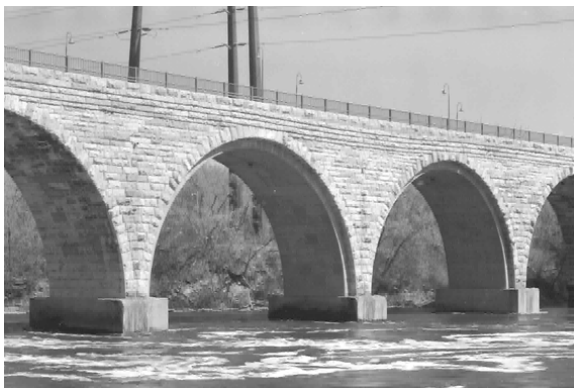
View showing the concrete liners of arch spans 6 and 7 and the concrete encasement of footings for piers 5, 6, and 7. Visible in the stone corbel line above the center pier is the sag caused by the 1965 flood.
